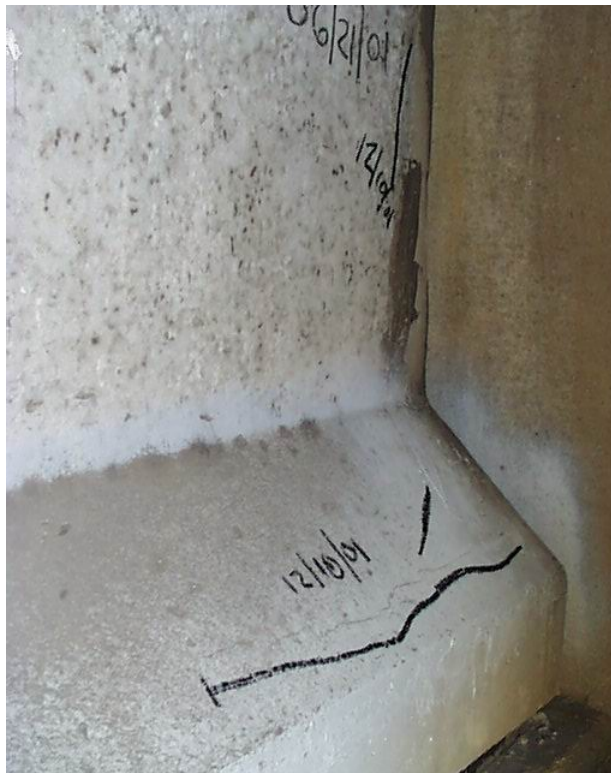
New cracks on north surface of NW Girder 3, Robinson Road, at west abutment (12/10/01)
